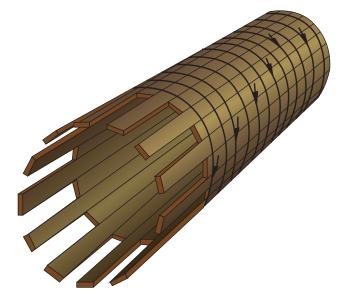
Some wooden water pipes constructed like long barrels in the 1700s are still in use in some early American cities.
